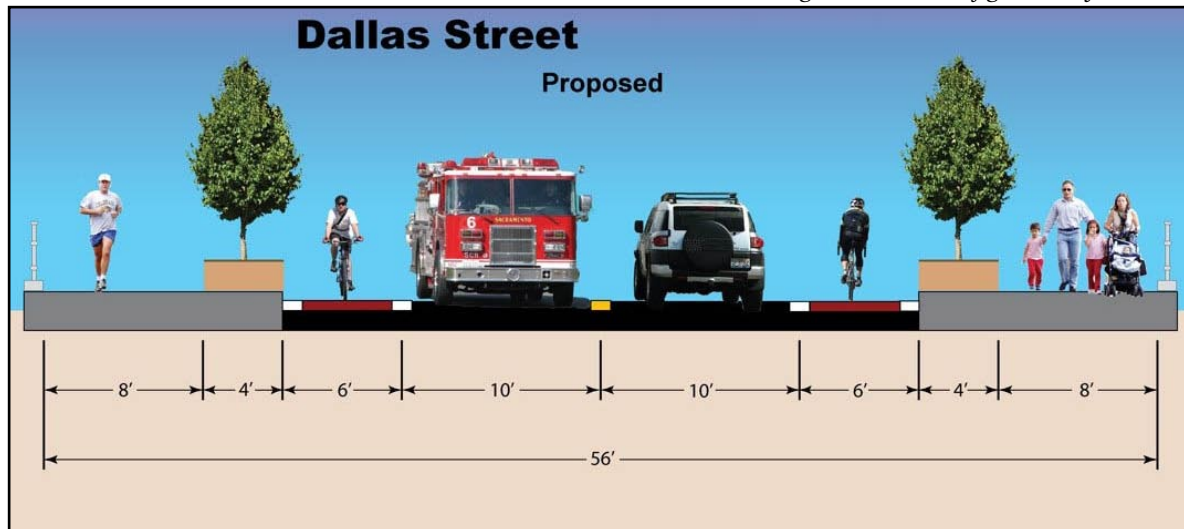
The recommended design for Dallas Street, also looking west, with new planters and bike lanes.
